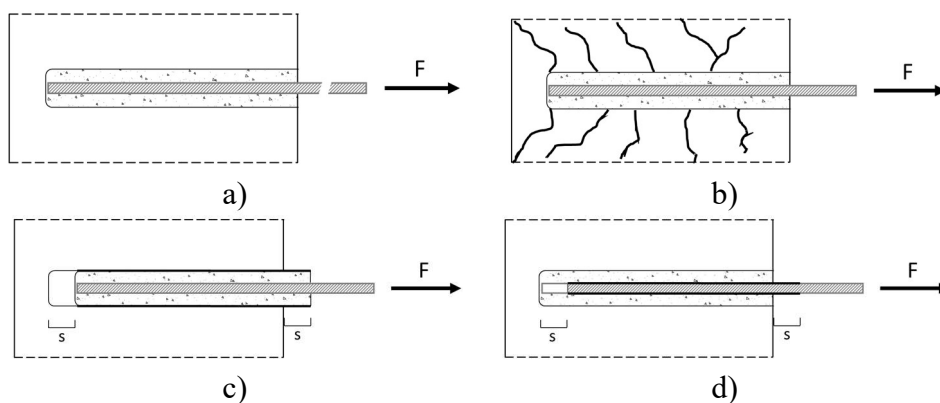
Failure mechanisms in anchoring systems: (a) Failure of the steel; (b) Failure of the masonry; (c) Failure at the interface grout/masonry; (d) Failure at the interface grout/steel (adapted from Araújo, 2014)
